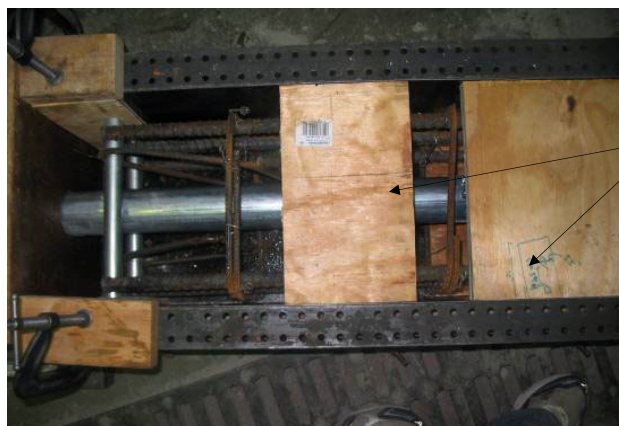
Photograph of Column 6 boxouts and lifting inserts.
